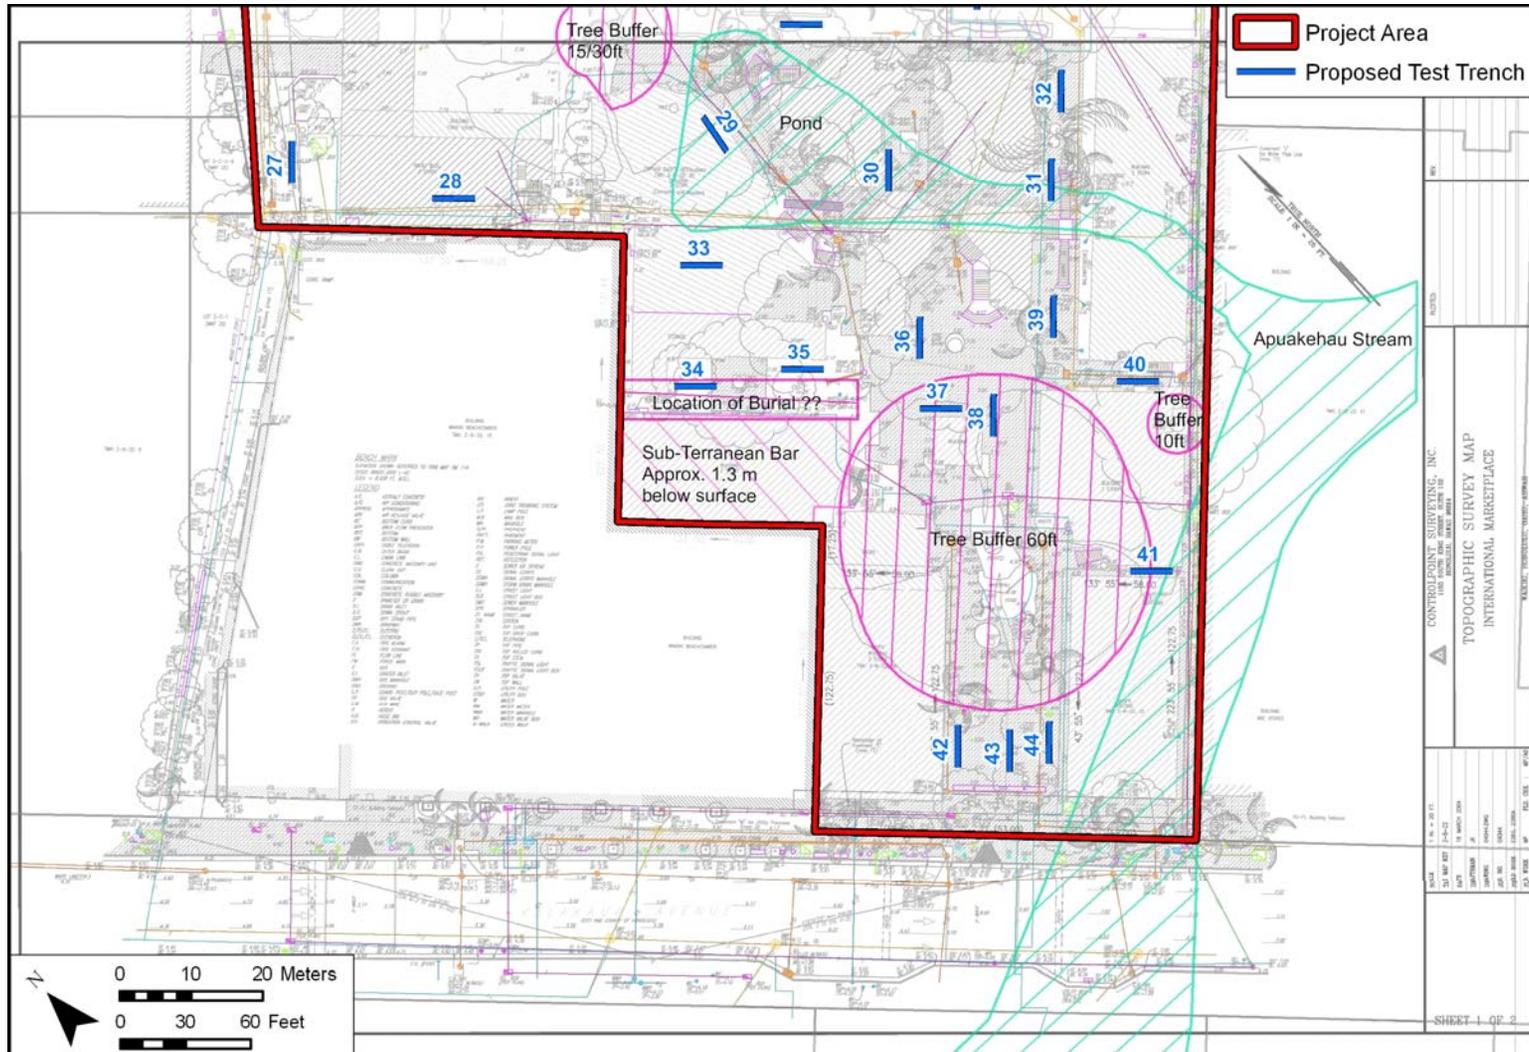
Plan of the International Market Place (*makai* portion) showing the project area outlined in red and the proposed test trench locations in blue
